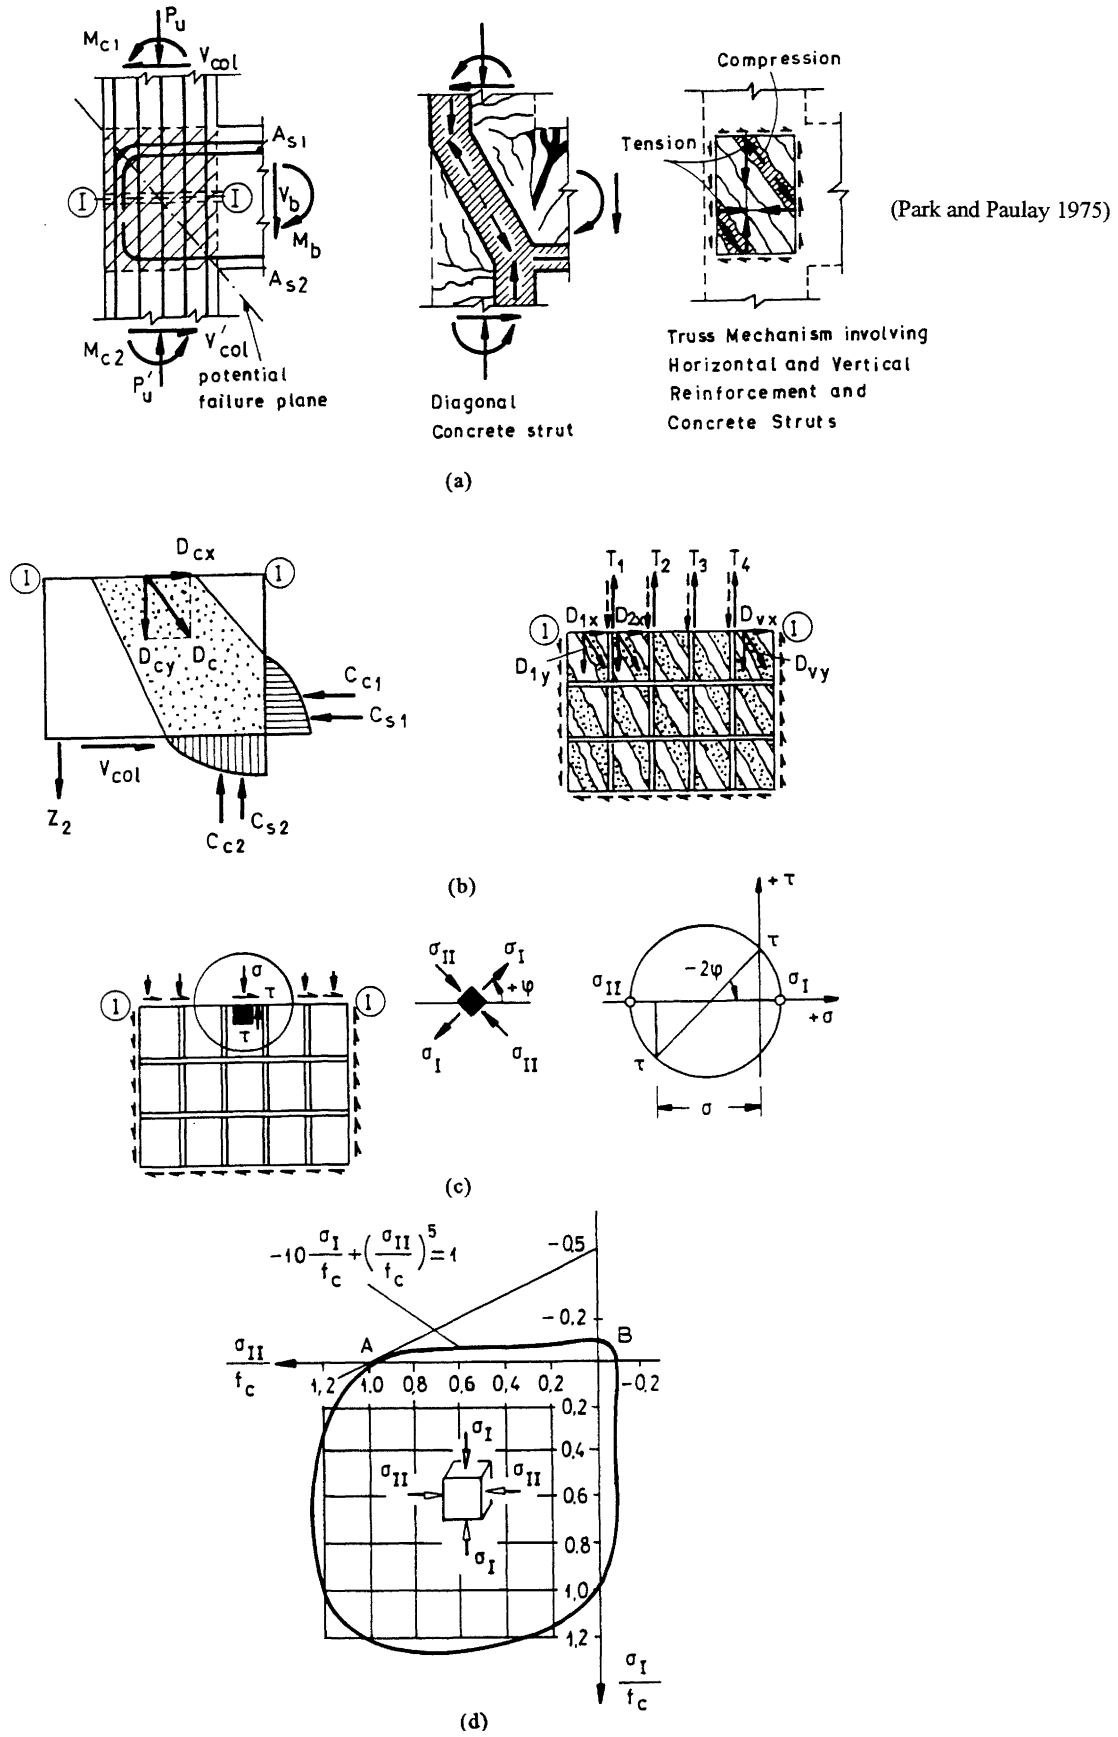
(a). External beam-column connection and the two mechanisms of shear transfer (diagonal concrete strut and truss mechanism), (b). Forces acting in the joint core concrete through section I-I from the two mechanisms, (c). Stress state of element of this studied region and (d). Representation of concrete biaxial strength curve by a parabola of the 5th degree.
